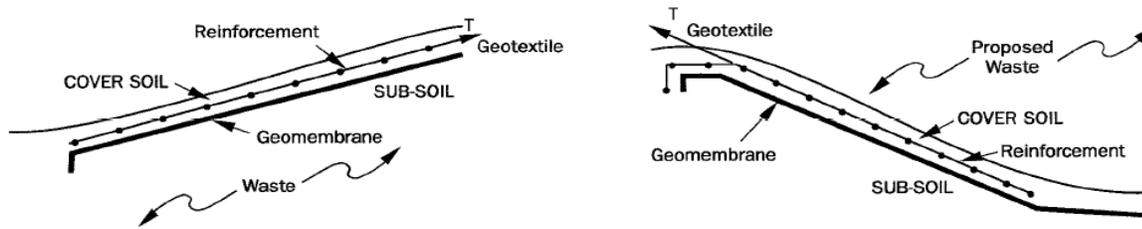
Cover Soil Reinforcement in Solid Waste Containment
